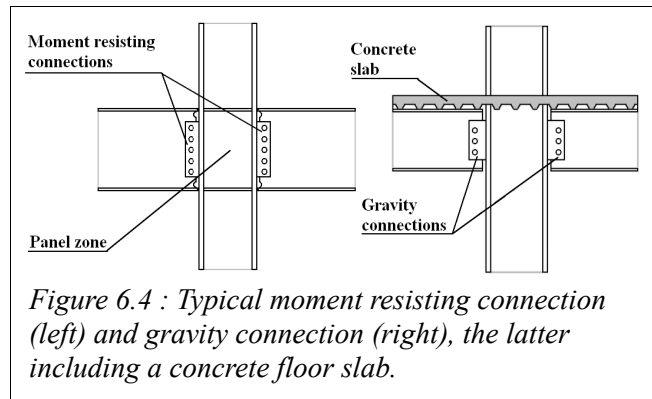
Typical moment resisting connection (left) and gravity connection (right), the latter including a concrete floor slab.
